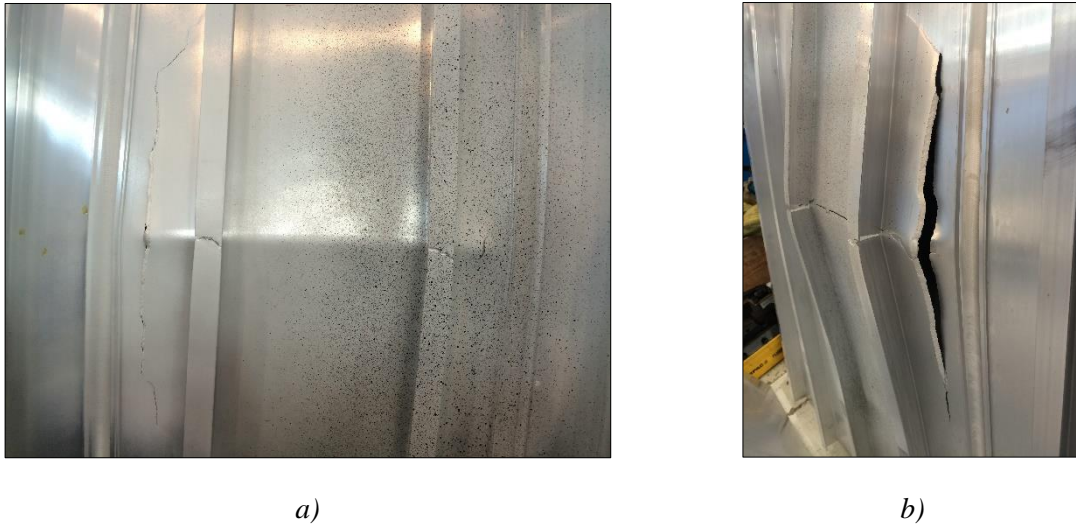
Fracture in a) QSTE1 and b) QSTE2.
